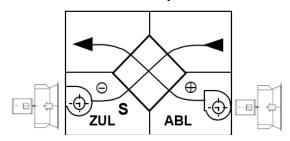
supply air sucking, exhaust air pressing; 1 pressure switch (S), 2 measuring points (+/-)
